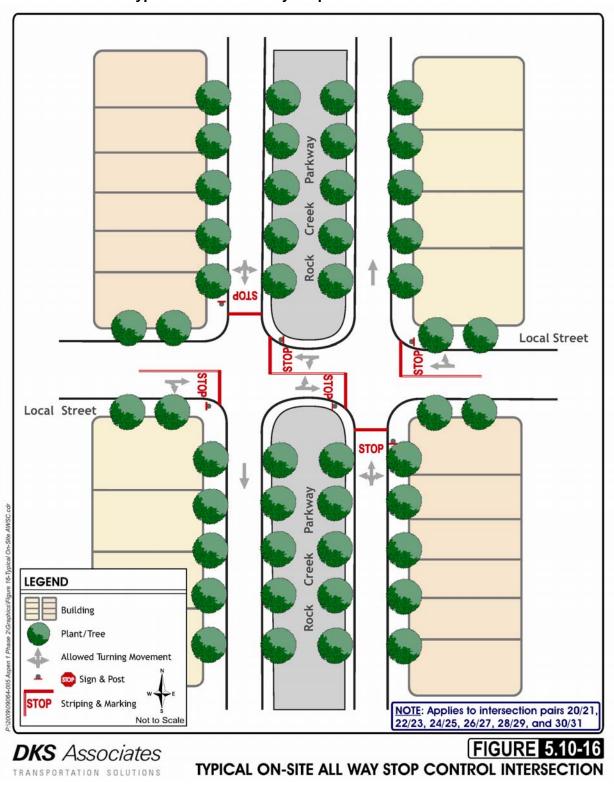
Typical On-Site All Way Stop Controlled Intersection
